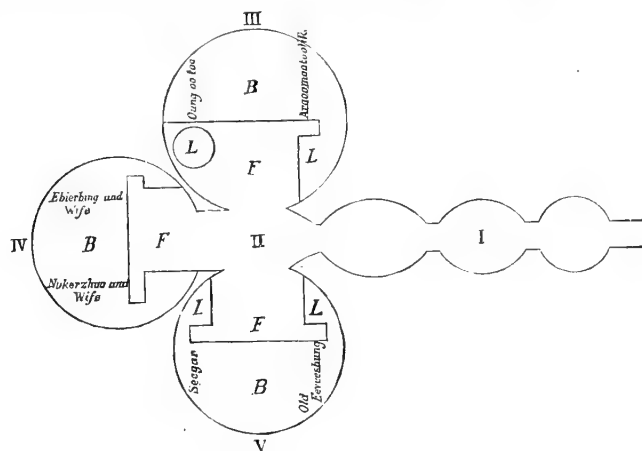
Plan of Hudson Bay qaggi or singing house. (From Hall II, p. 220.)
